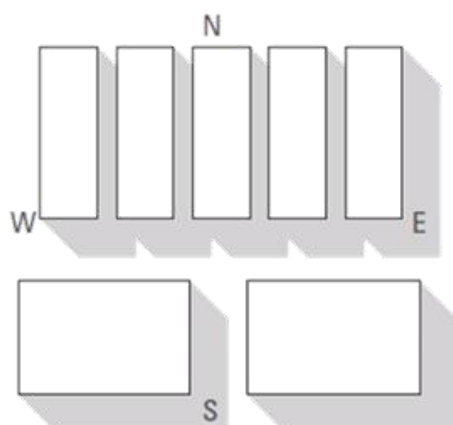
Narrow lots oriented along a north-south axis provide shade on the east and west walls of neighbouring lots. Wider lots should be oriented east-west to minimise the area of exposed wall on the eastern and western facades.
